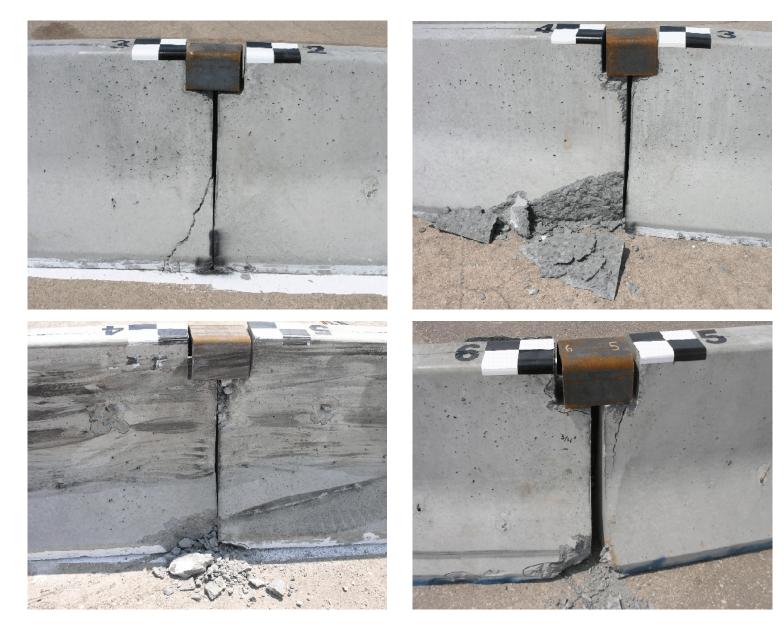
Joint Connection Damage - Joints 2-3, 3-4, 4-5, and 5-6, Test NYTCB-1
